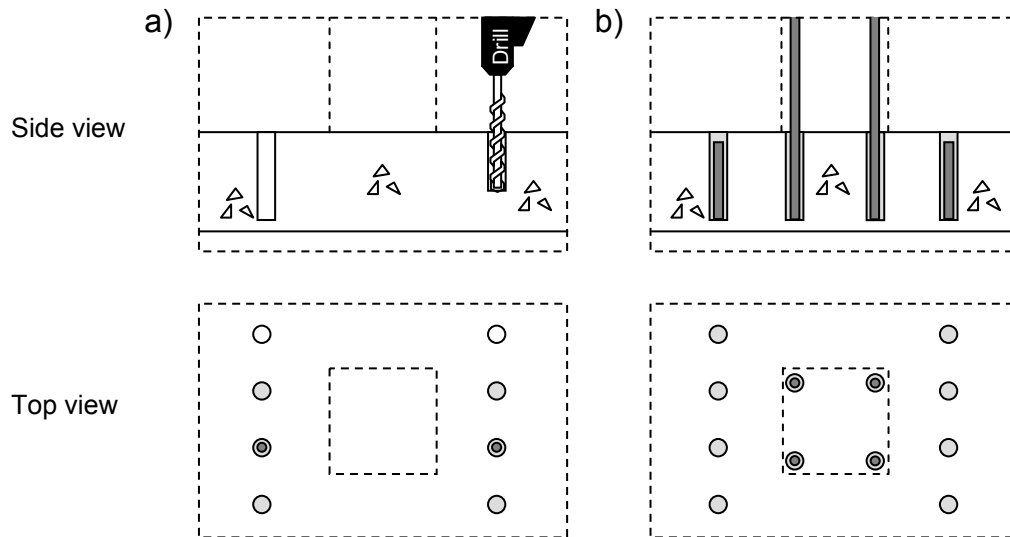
a) Post-installation of dowel reinforcement; b) Post-installation of column starter bars
